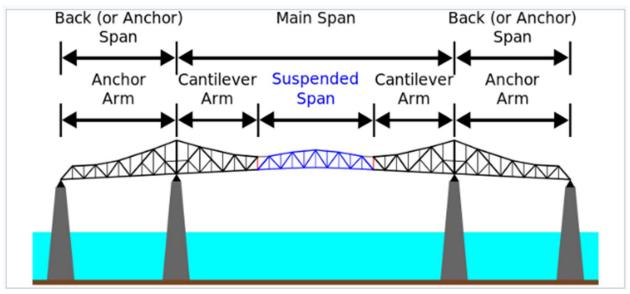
Simple Cantilever Bridge [49]
